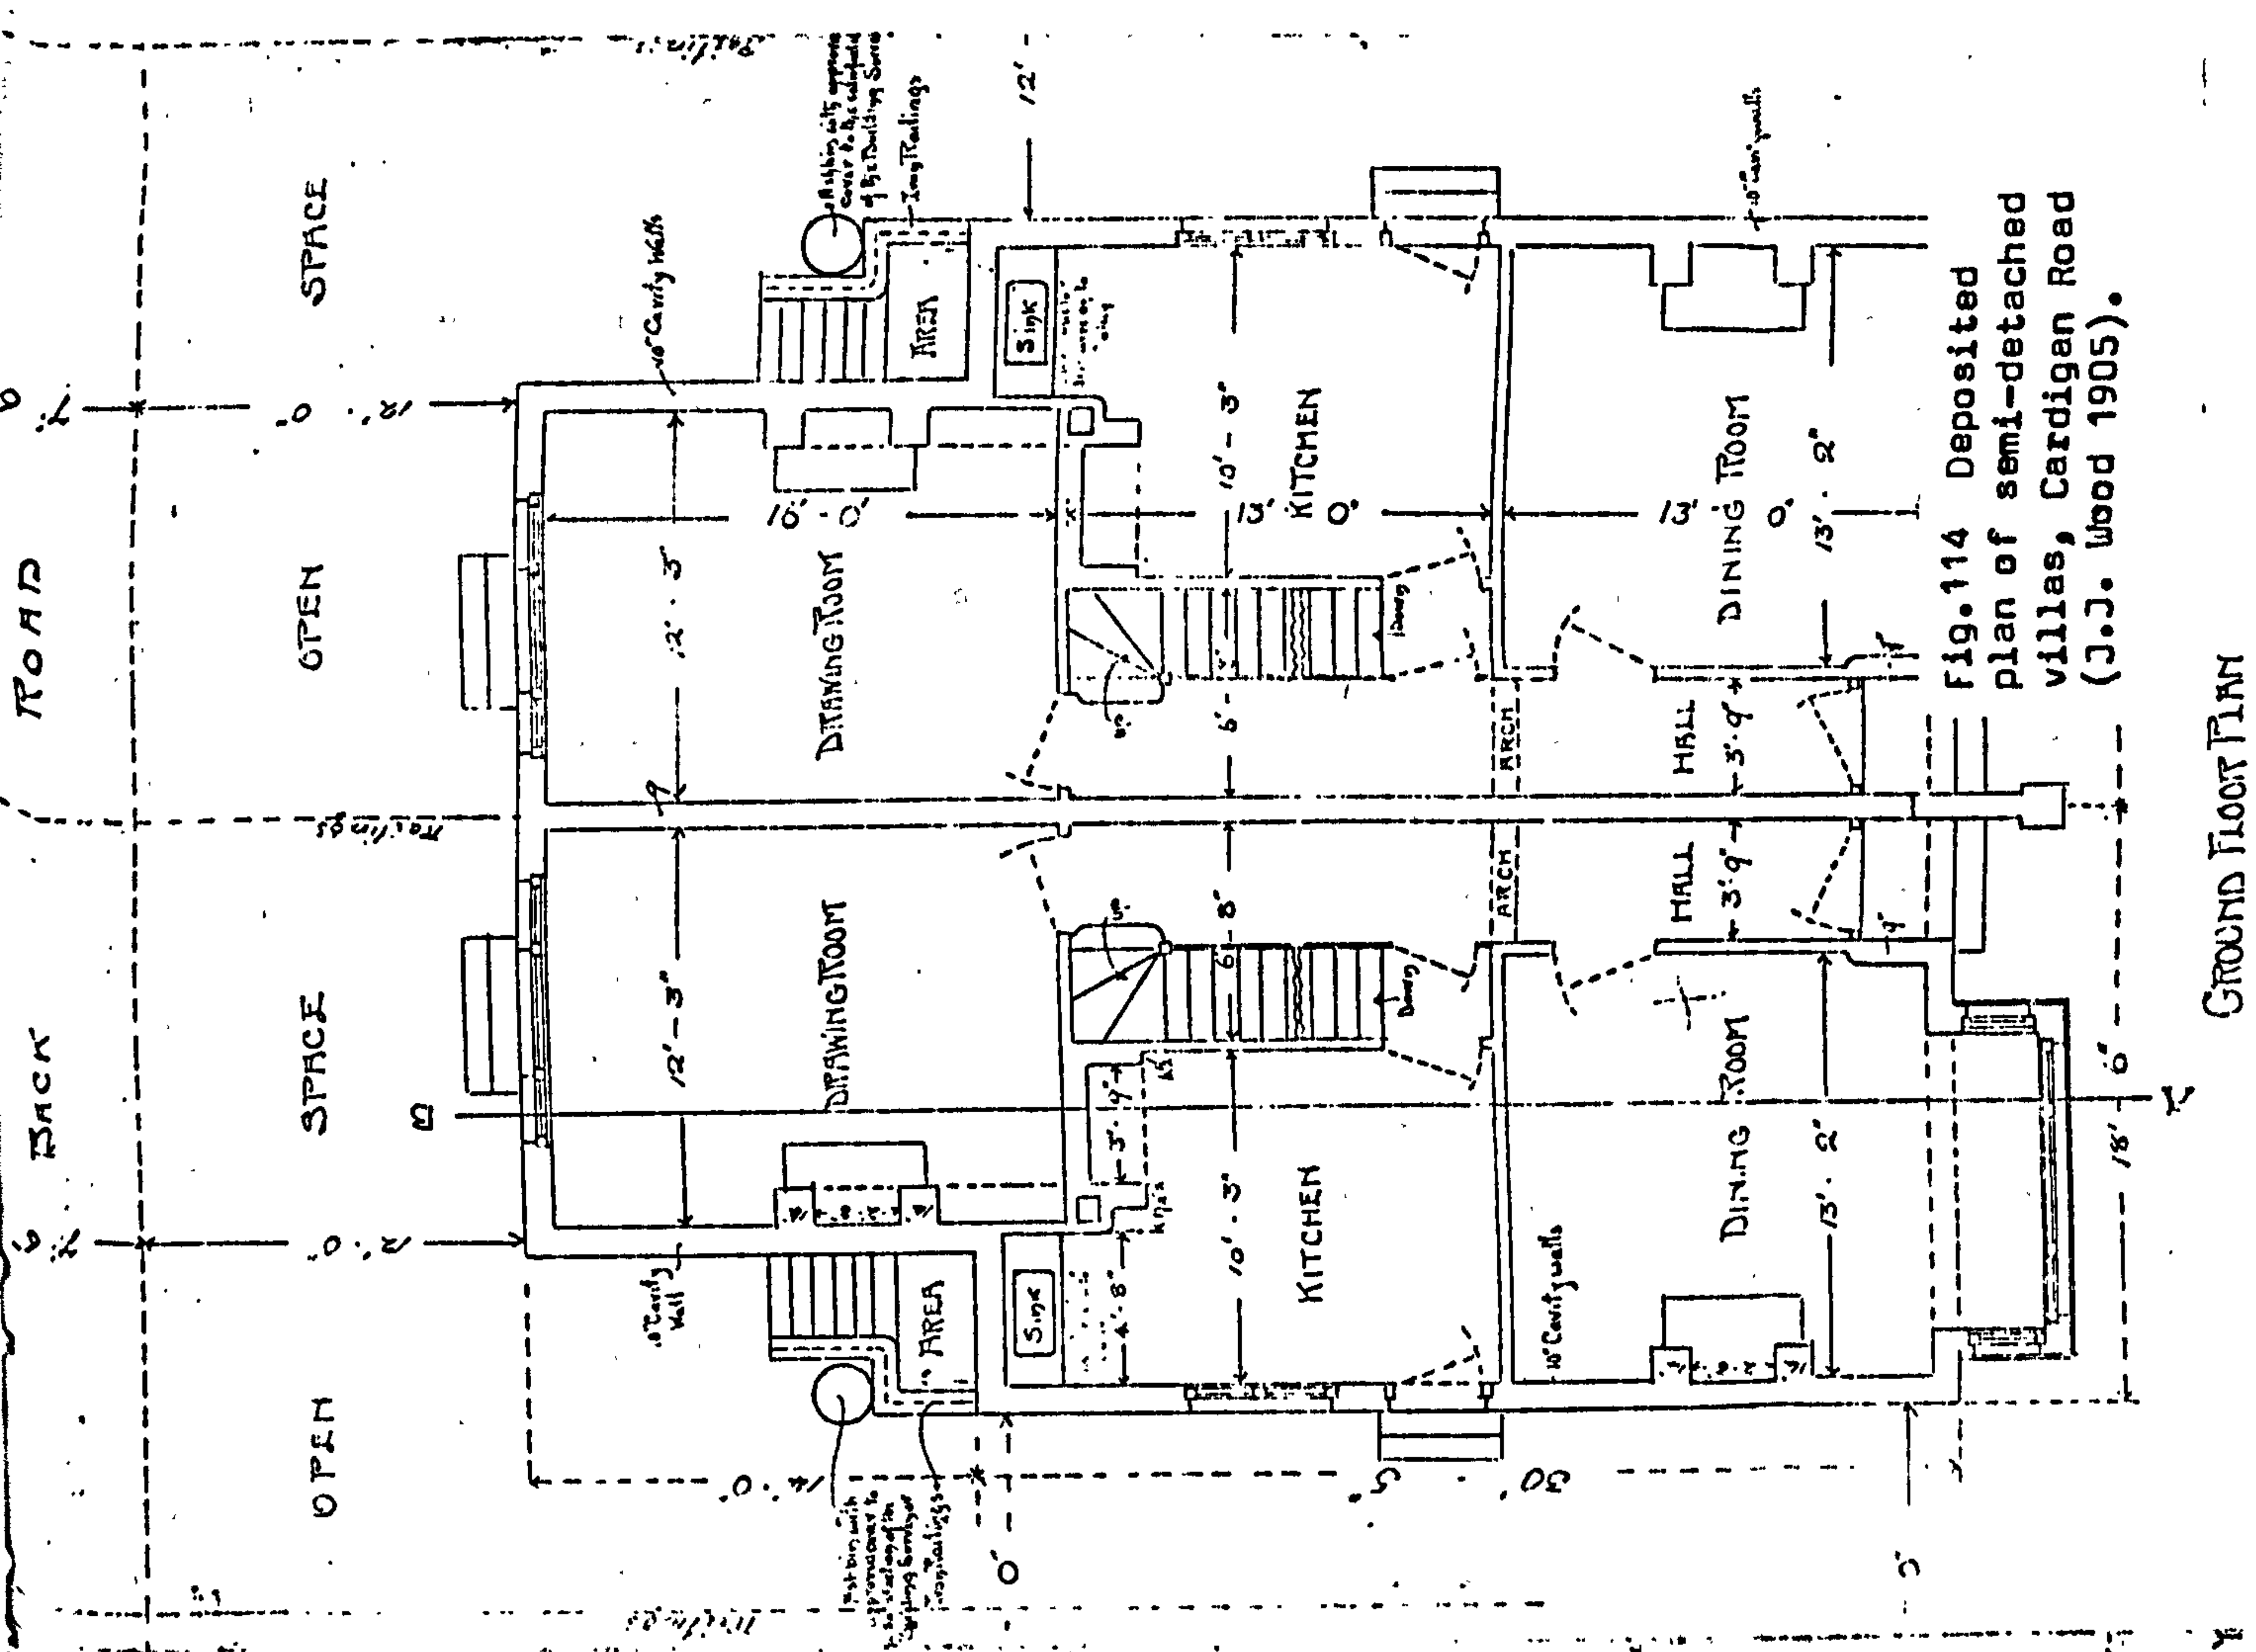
Deposited plan of semi-detached villas, Cardigan Road (J.J. Wood 1905).
